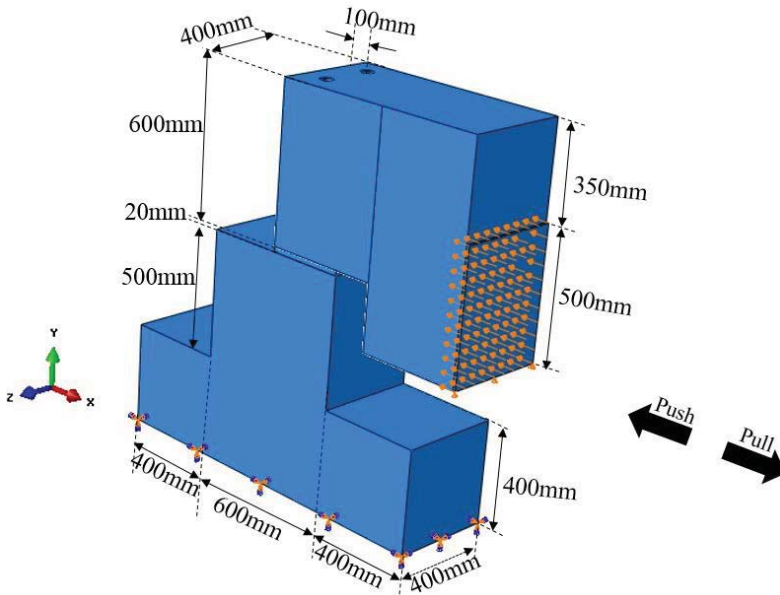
Boundary Conditions of Pinned Beam Column Joint
